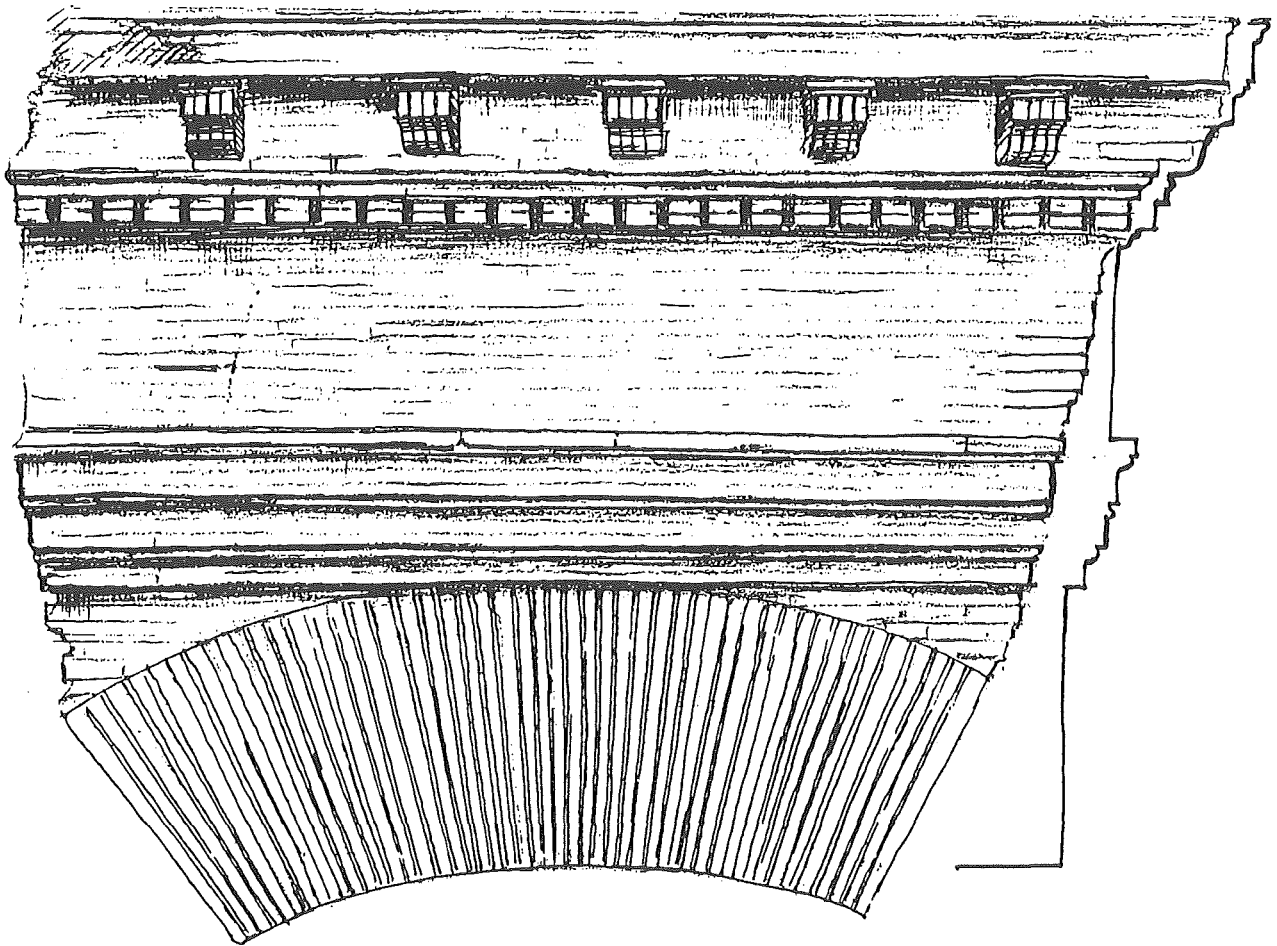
Part of elevation belonging to semi-circular arched portico. The drawing is partly a reconstruction combining the arch from one fragment (9a) and the cornice from another (9b).
